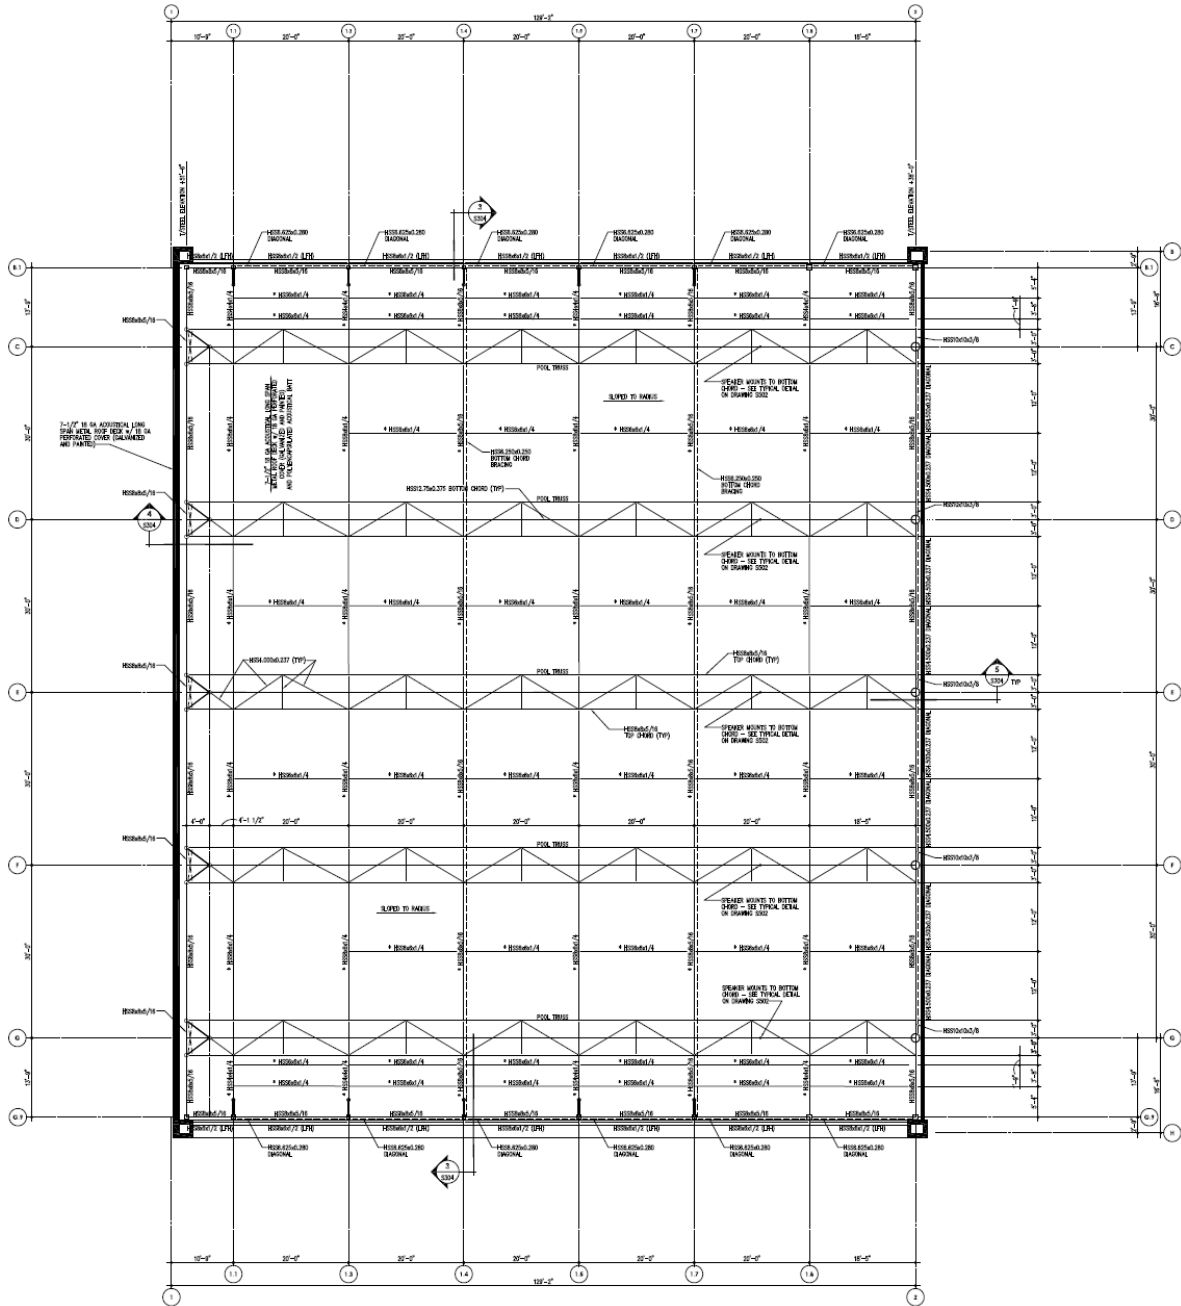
Roof Framing Plan (including the five large trusses above the pool area and additional framing)
